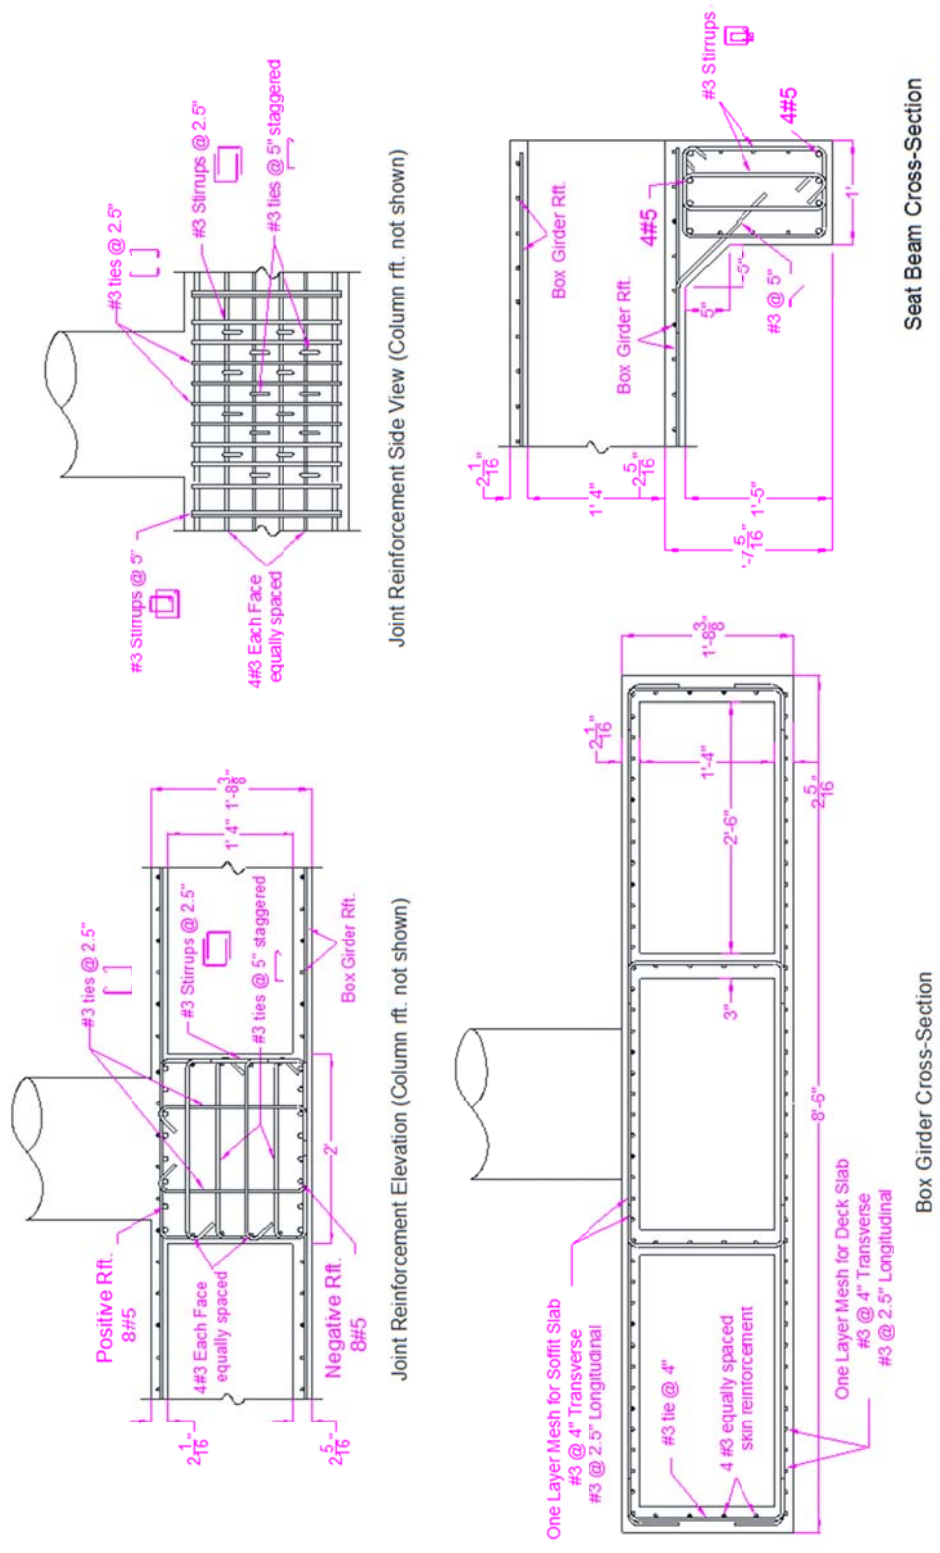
Details of longitudinal and transverse reinforcement for the specimens' joint, box-girder , and seat beams sections
